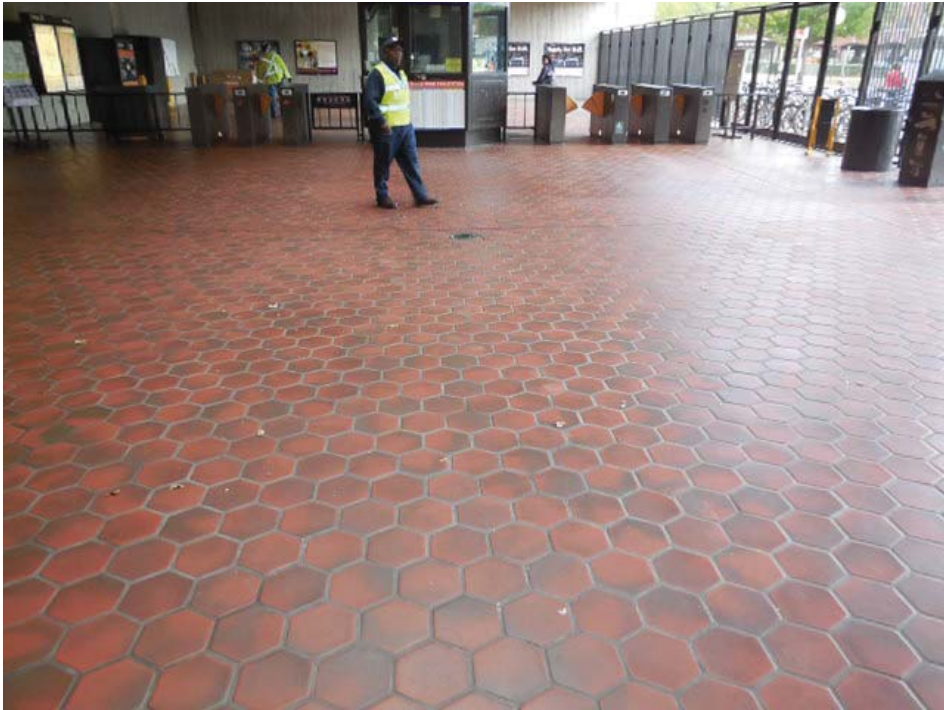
C12 Braddock Road – Handhole in Mezzanine area
